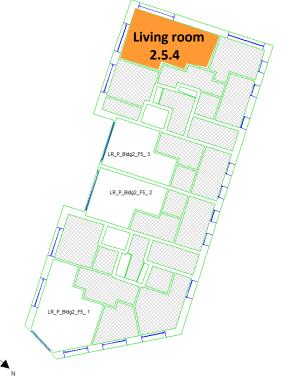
Level 5 living rooms in Building 2 (larger plan in Appendix A)
